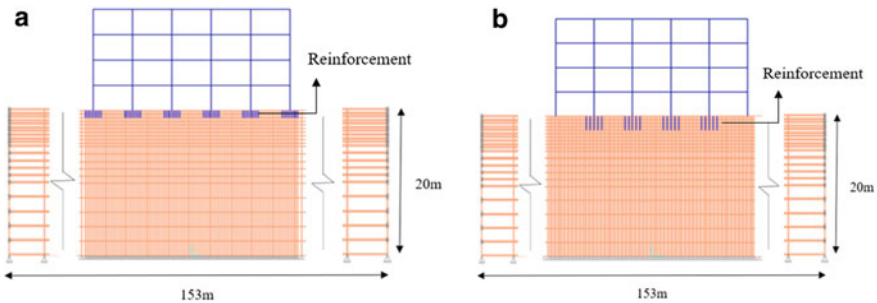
a Front view of space frame resting on reinforced soil (reinforcement below all footings). b. Front view of space frame resting on reinforced soil (reinforcement below internal footings only)
